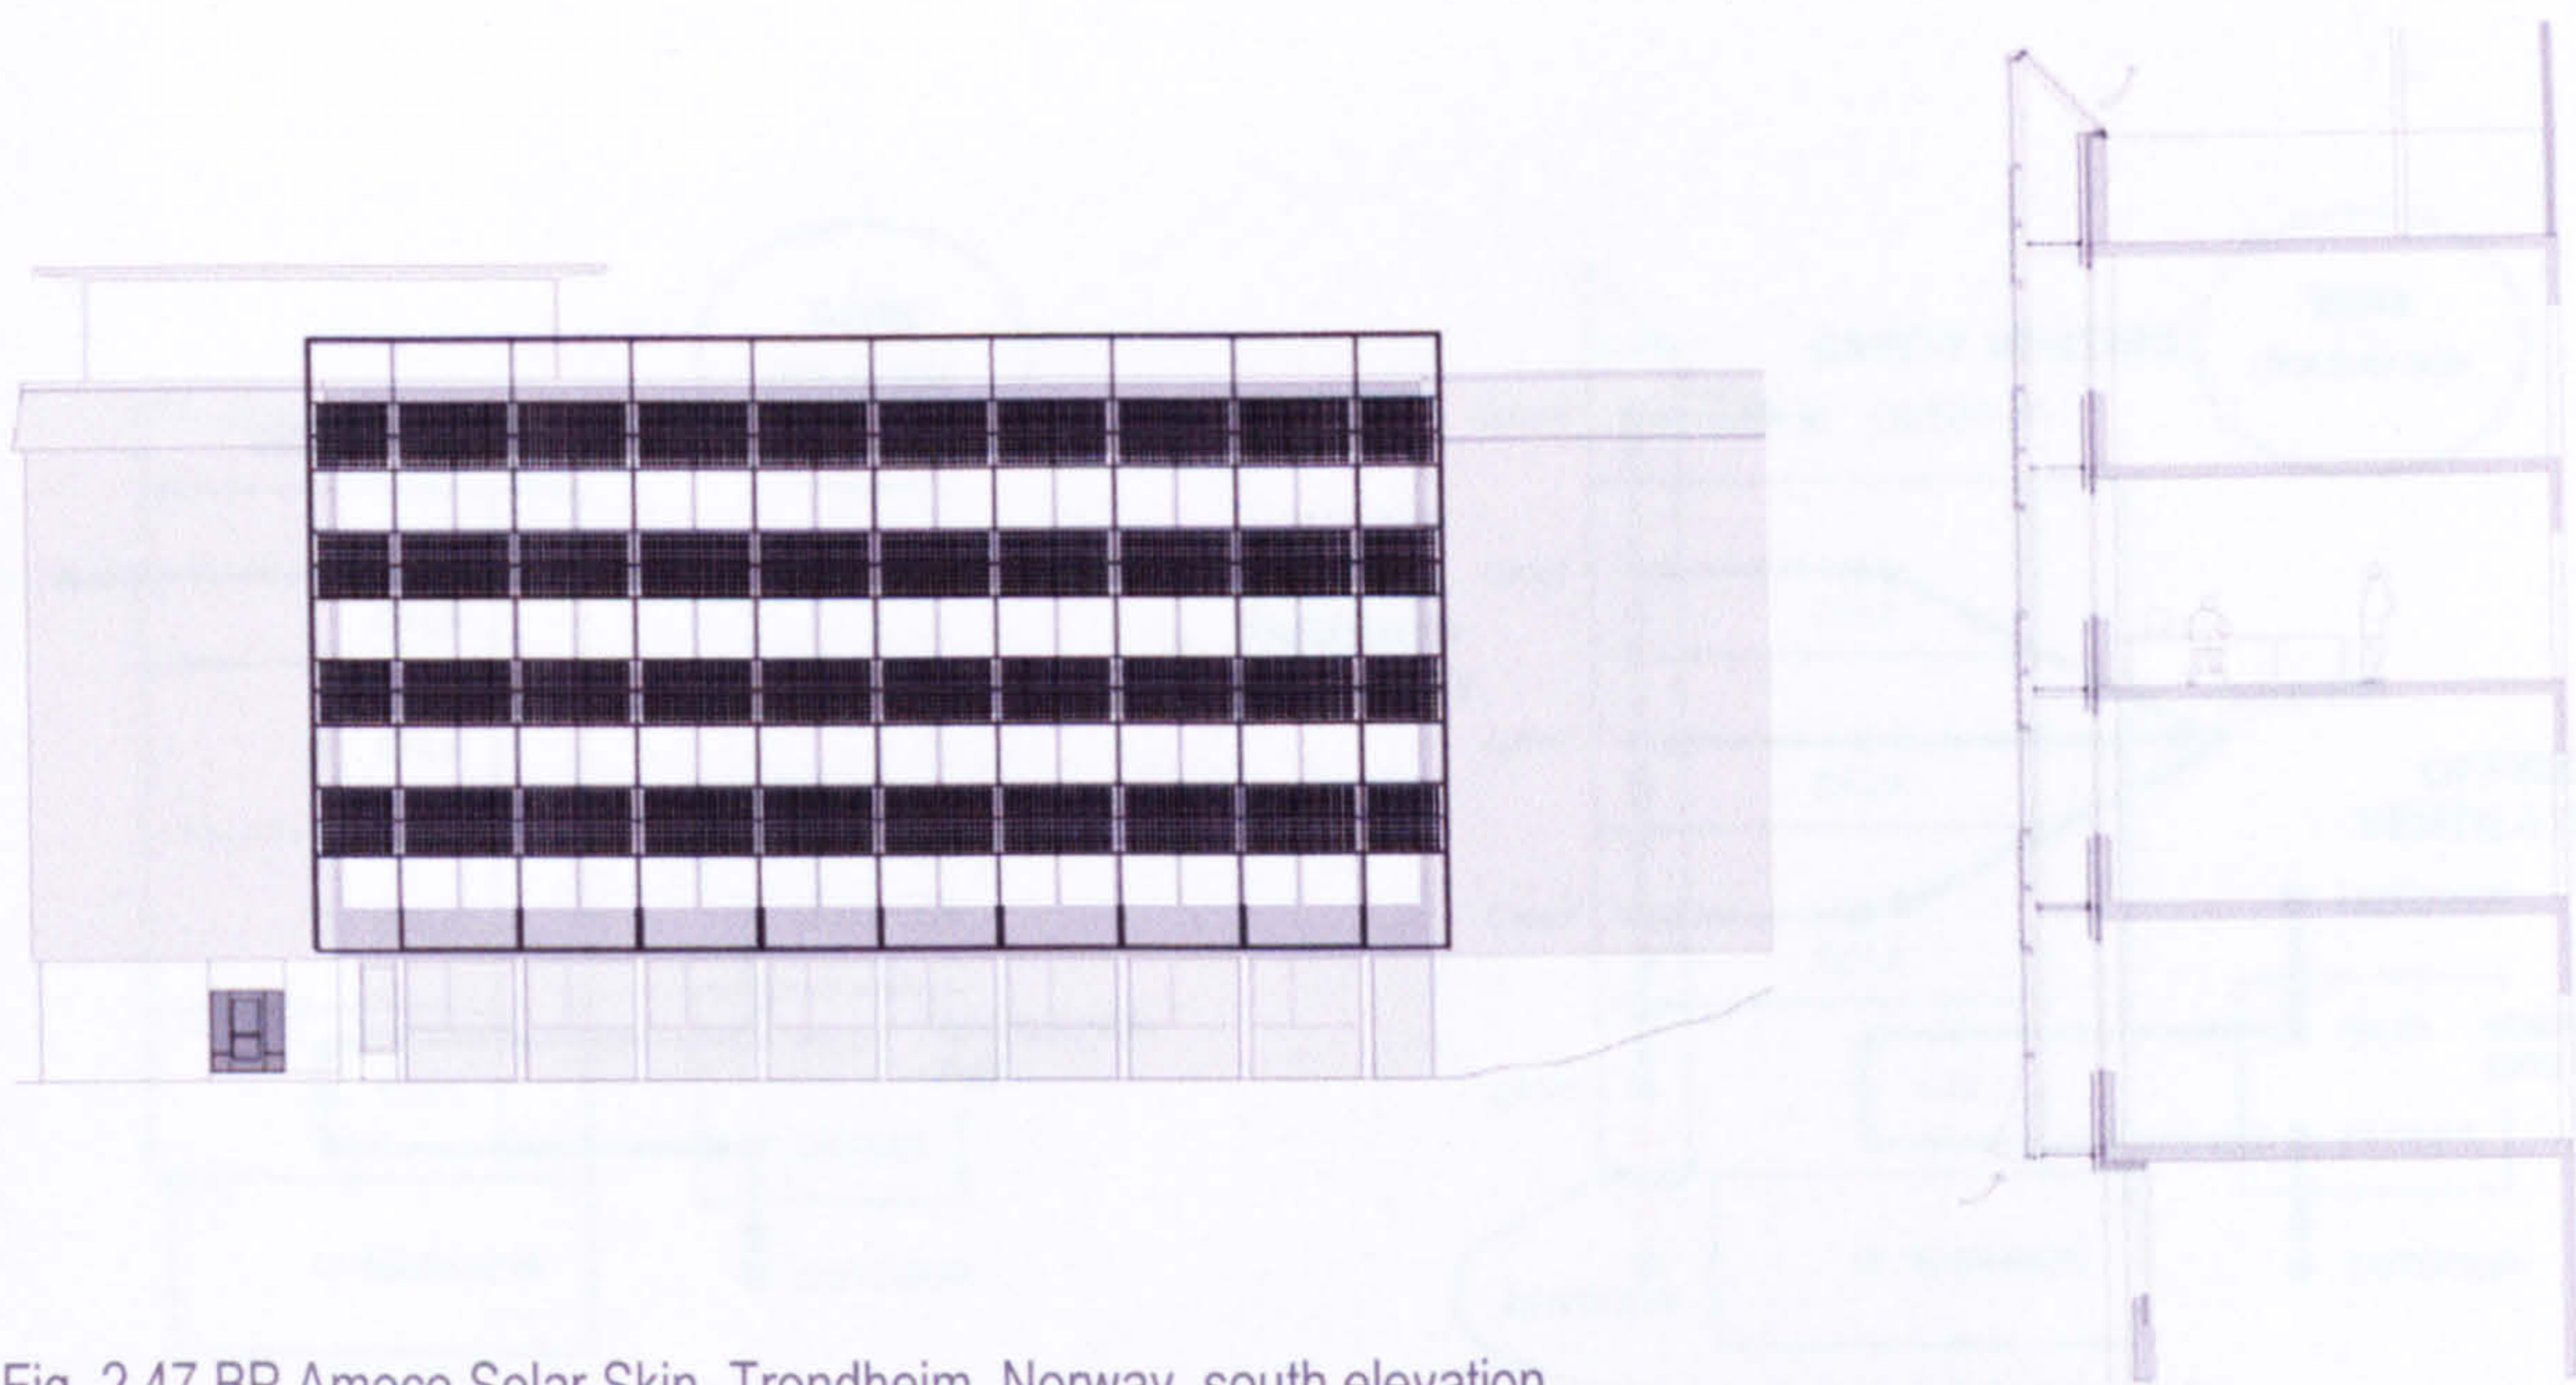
BP Amoco Solar Skin, Trondheim, Norway, south elevation and cross section.
